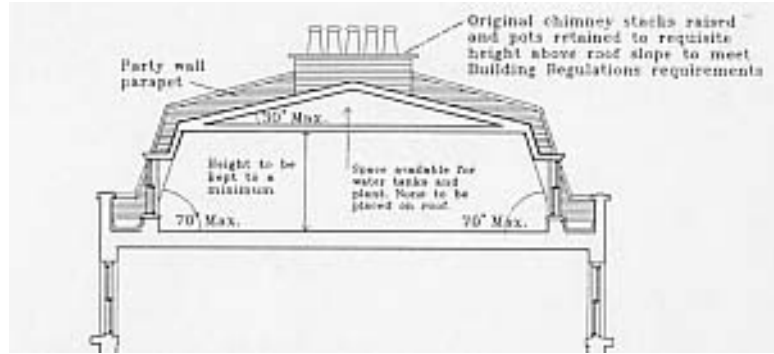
B: Double-pitched Roof Extension, Diagrammatic Section.
